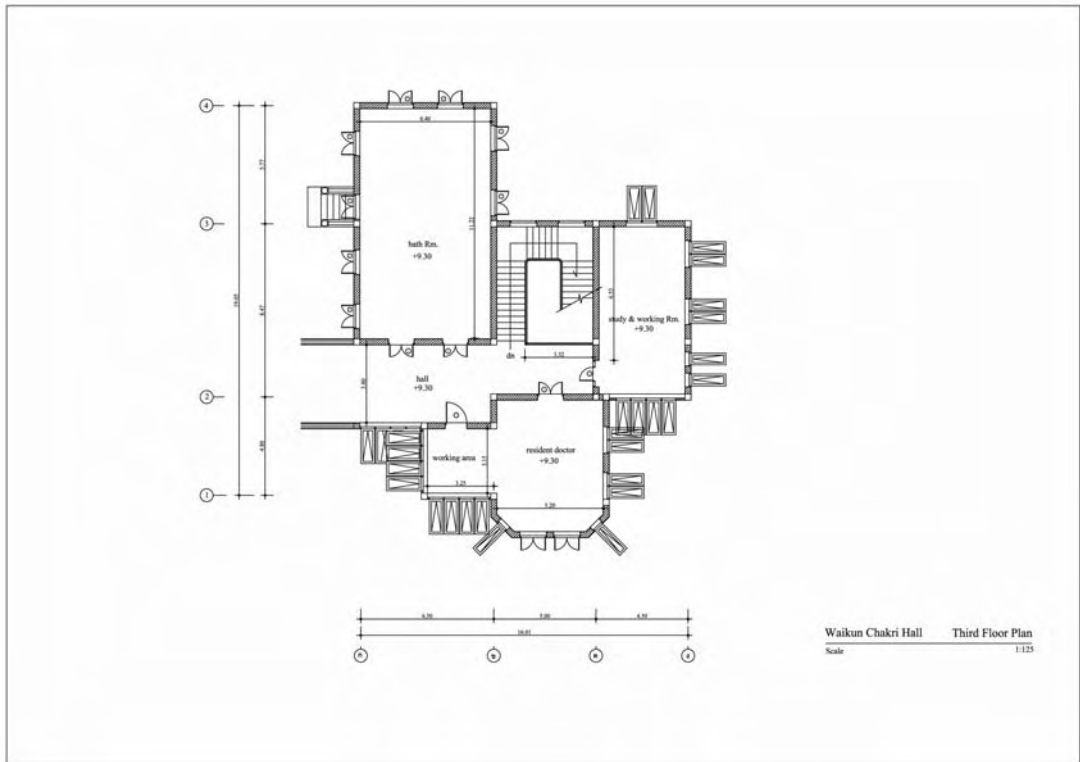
Third floor plan of Waikun Thepayasthan Hall
